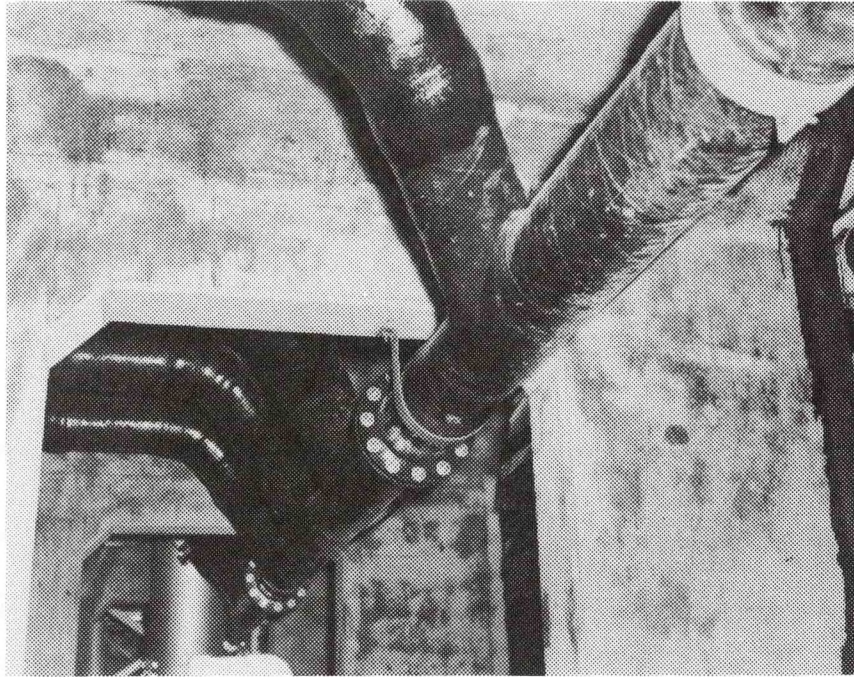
Fiberglass header pipe for the barge loading line at McNary Dam.
